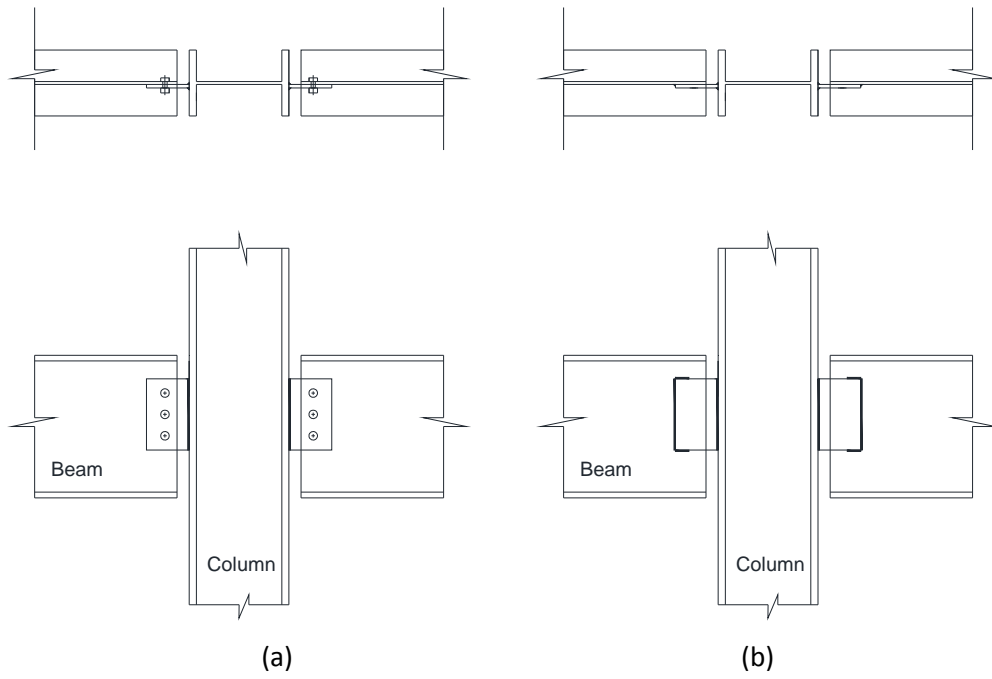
Types of shear tab connections: (a) welded-bolted (b) welded-welded
